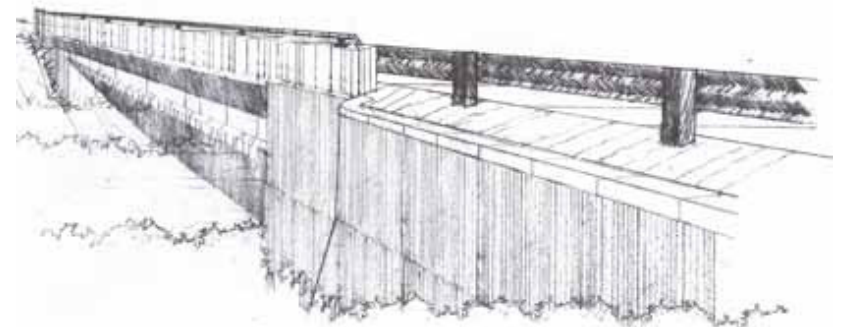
t: The parapet extends beyond the bridge to create a distinct rail termination.
